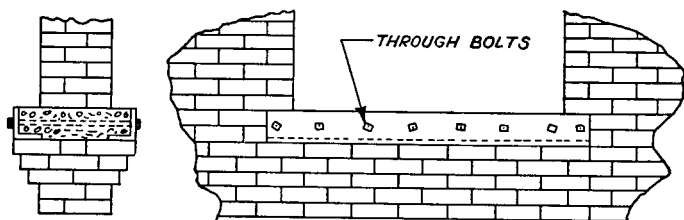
Angle iron and concrete sill supported by a corbel of brick used with combustible floors.
